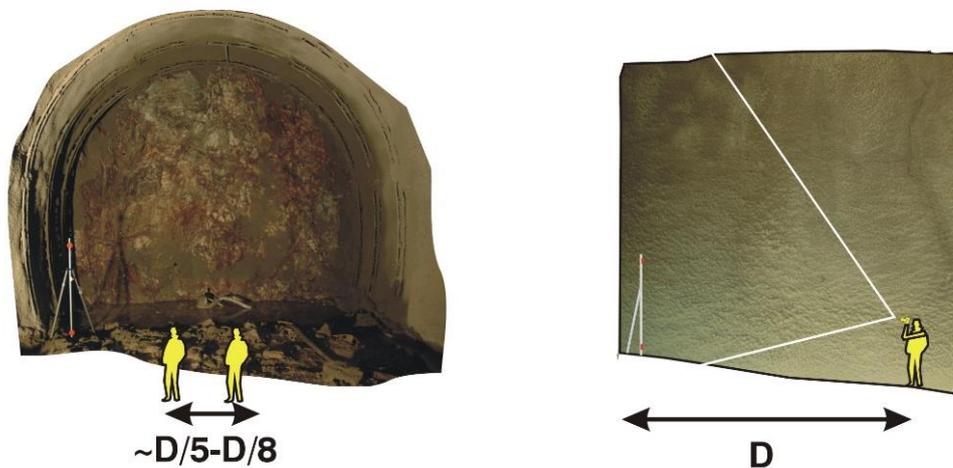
Principle geometric arrangement and position of Range Pole when acquiring a tunnel face
